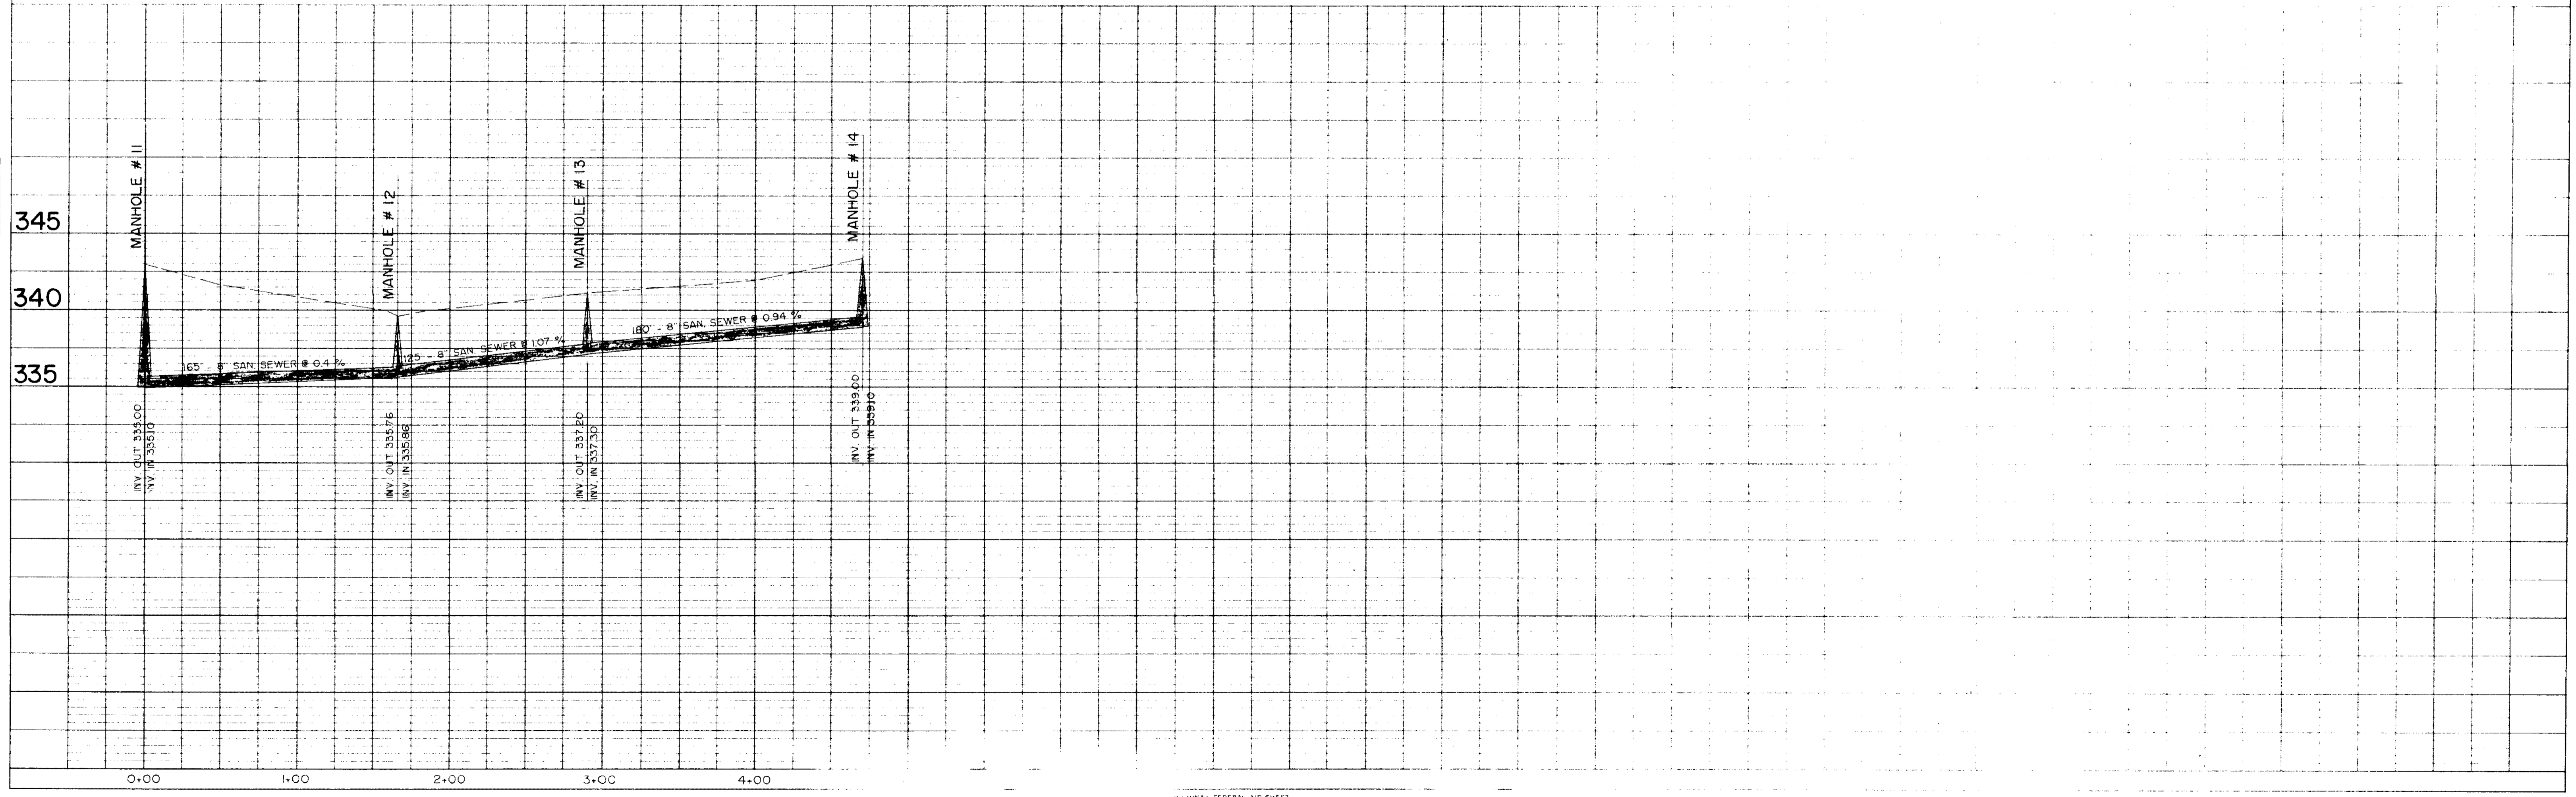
SINGLE PLAN AND PROFILE - FULL LINE
